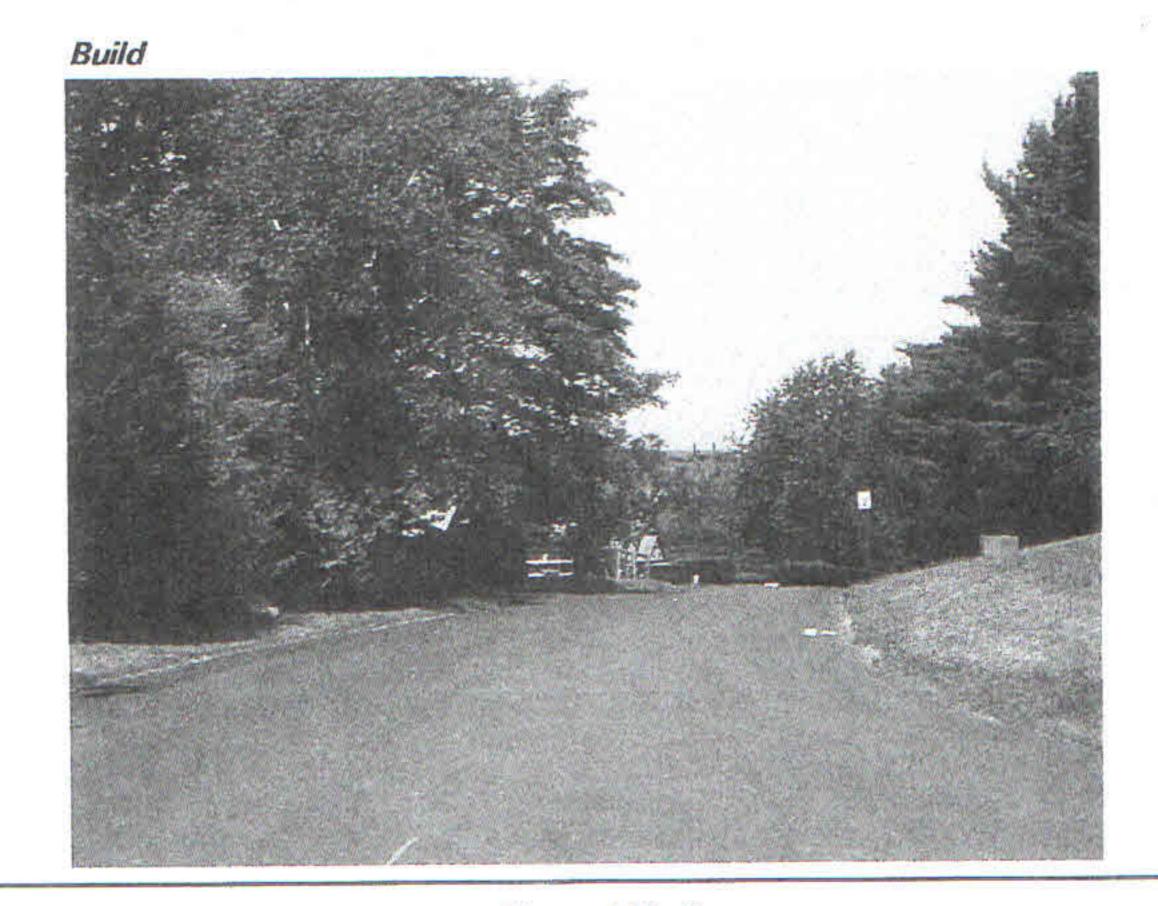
8 Photo Location 7 Buckwheat Hill, Meriden
